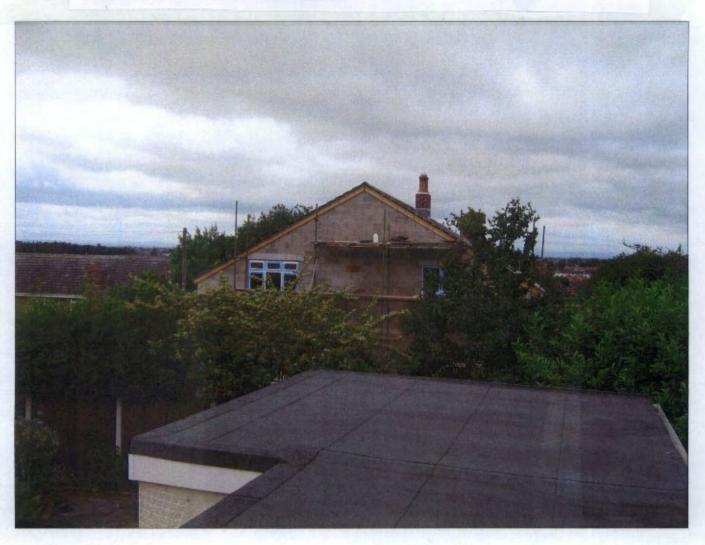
Photograph looking northwards towards the application site, which is taken from a first floor bedroom to the rear elevation of the objector's property, Nevarra. At the time that the photo was taken the external smooth rendered finish had not been applied.
